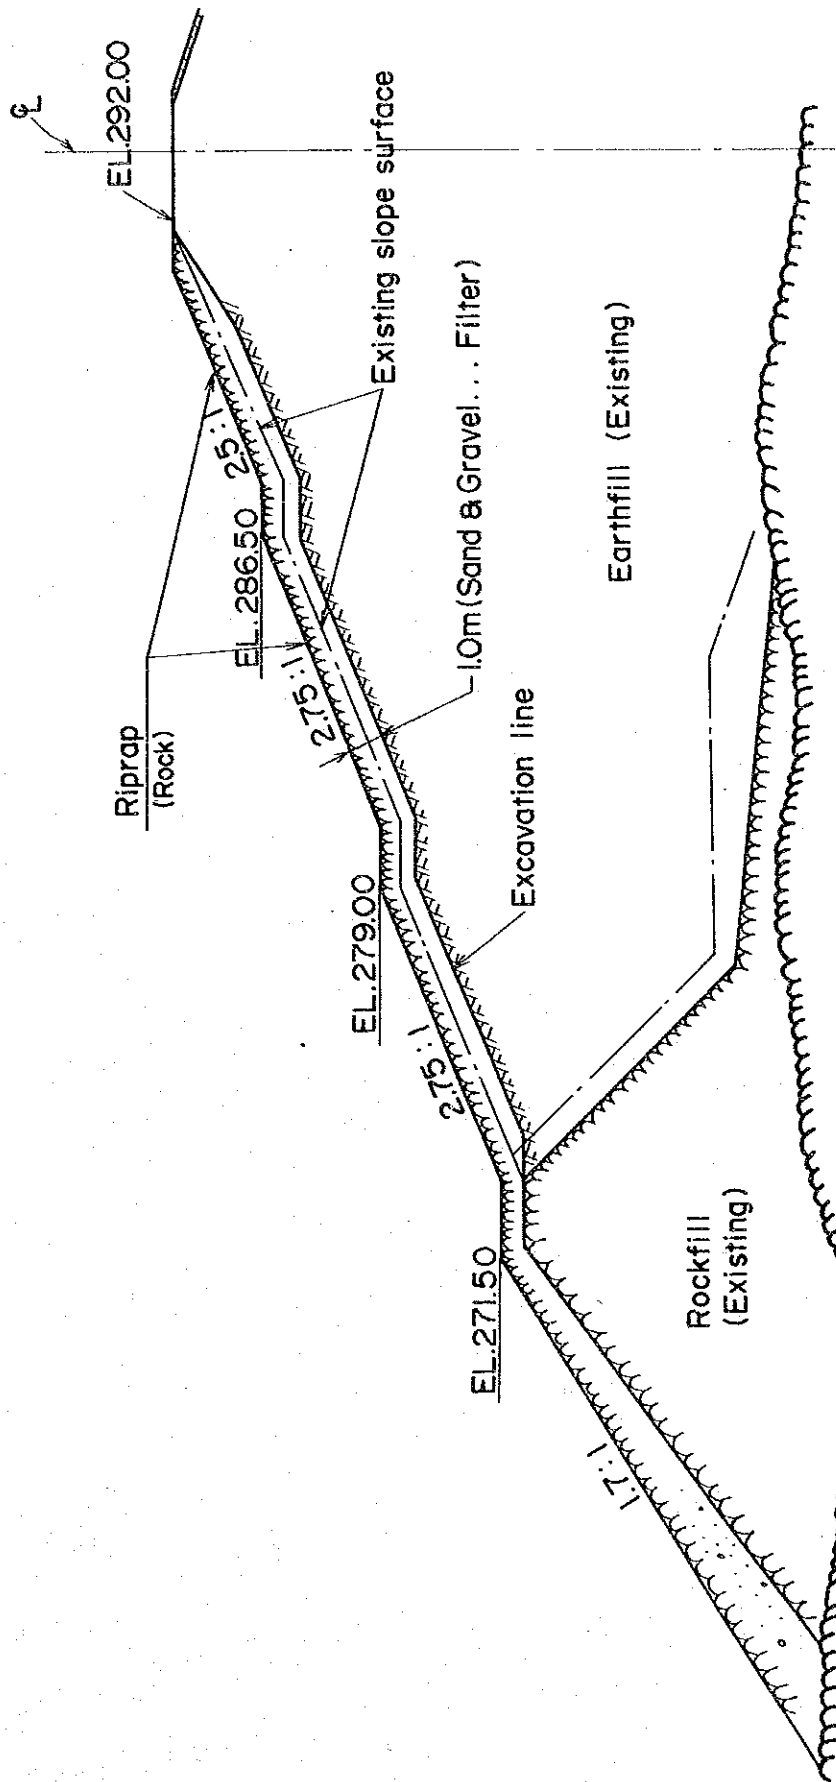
/1 Remedial Works for Downstream Slope of Dam
